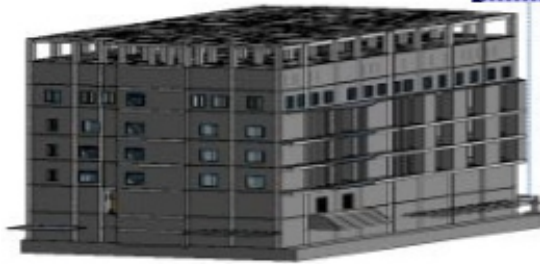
7th floor level beam Figure 30: 8th floor level and slab, 5th FL wall and floor and column and 7th floor level stair and 4th FL D & W for phase 19 shear wall, 6th floor level wall and floor and stair and 5th FL doors and windows for phase 20
